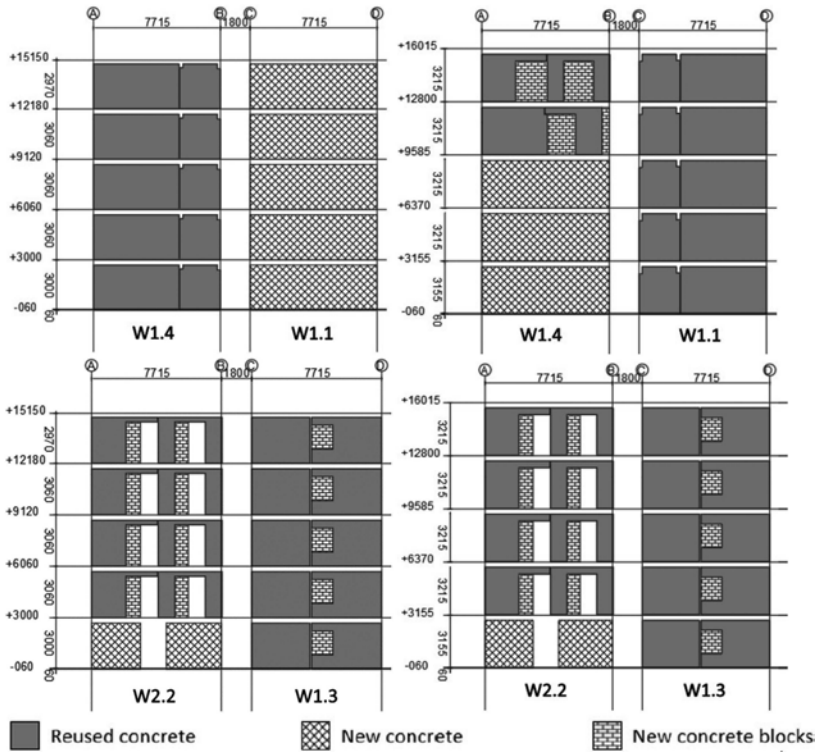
Configuration of façade elements in approach one (left) and approach two (right).
